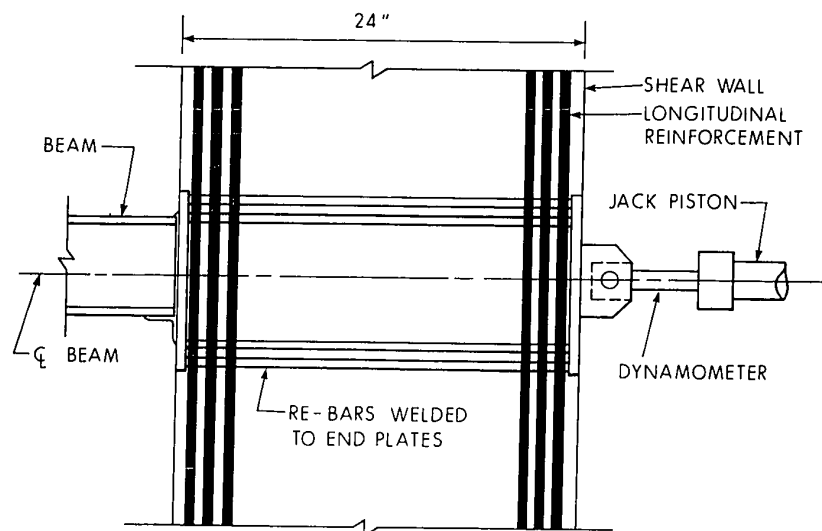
TYPICAL BEAM-TO-WALL JOINT
